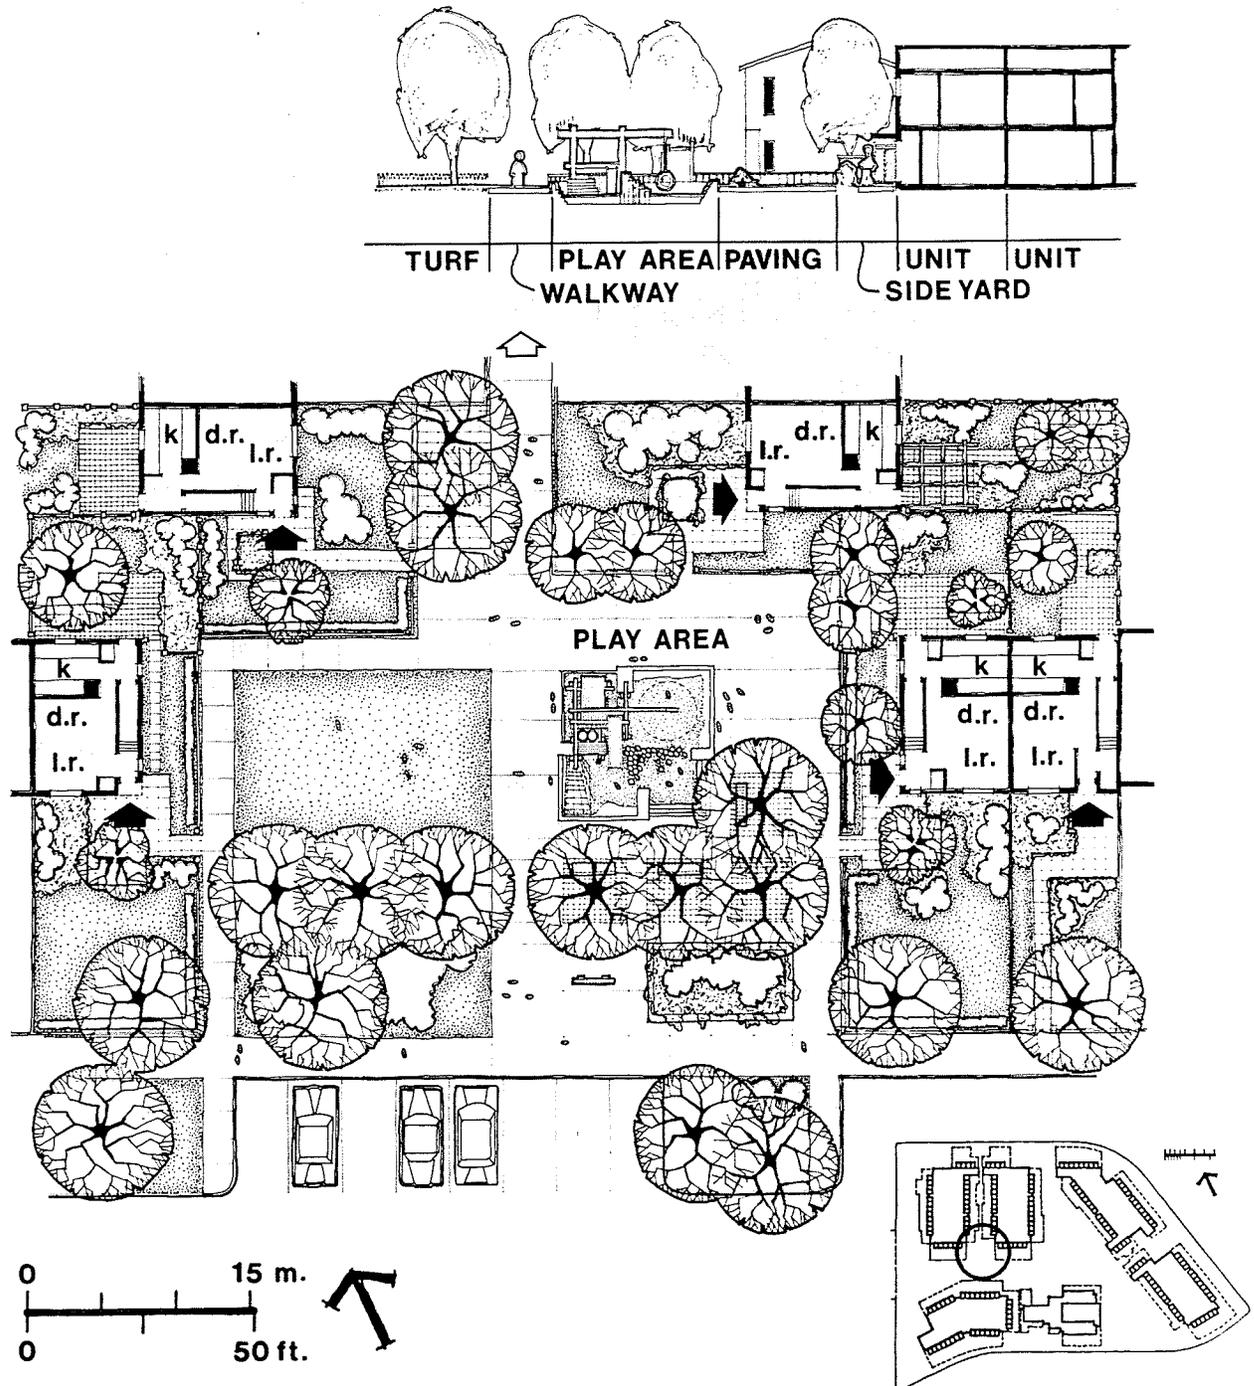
Alternative 2: Detail of Spaces Around Play Area
